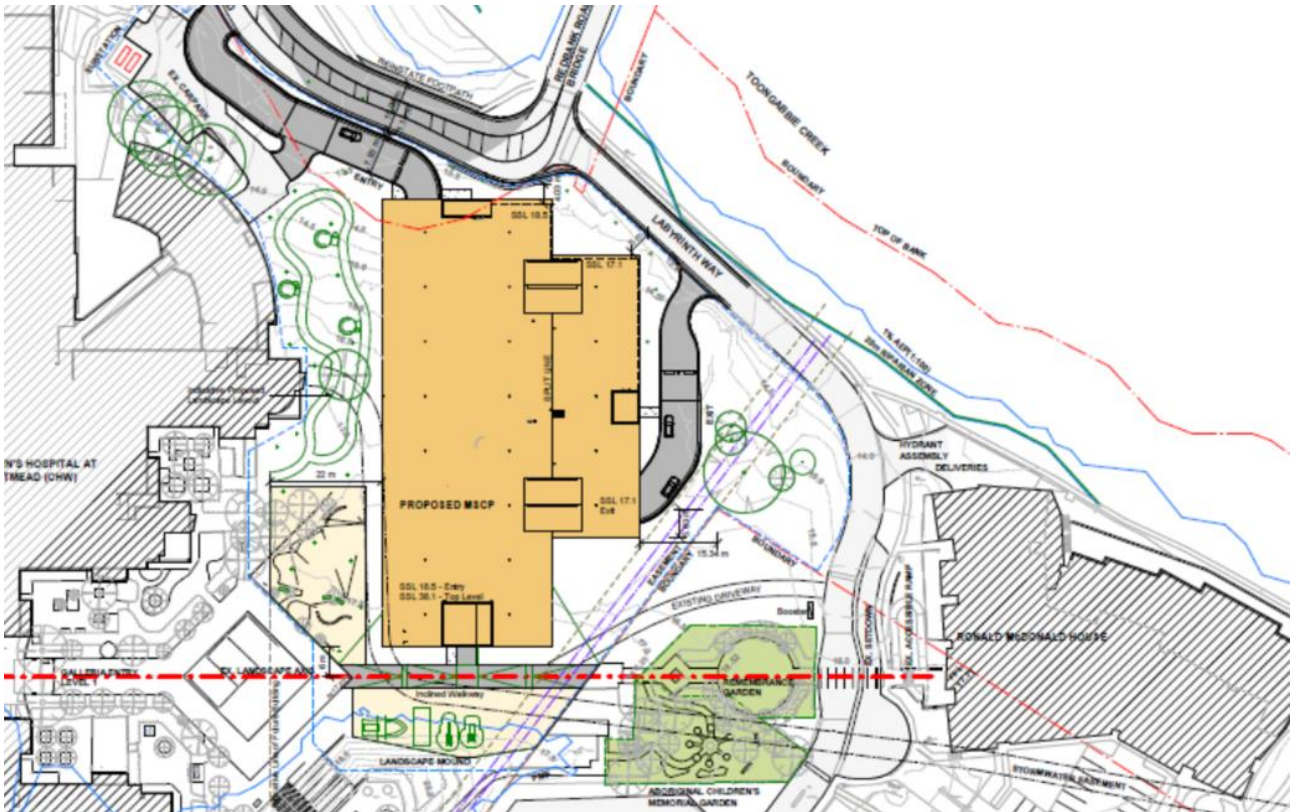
Proposed site plan for works under SSD-10434896 (Source: RtS Report (SSD-10434896) MSCP, The Children's Hospital at Westmead, Architectus Australia, 23 July 2021)
